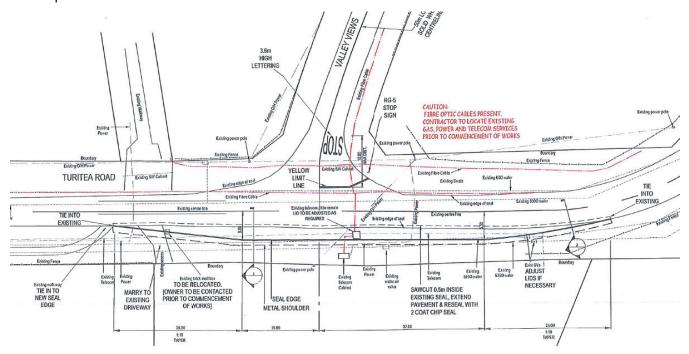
Planned Improvements at Turitea Road/ Valley Views Intersection
